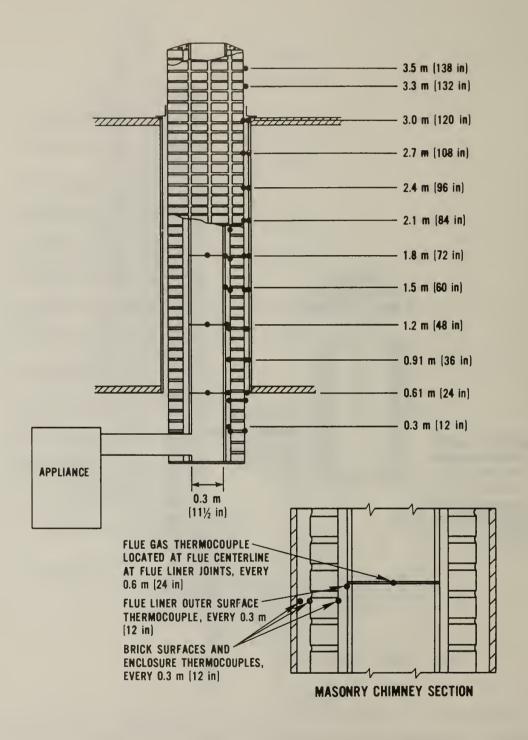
Instrumentation Locations for Tests of Masonry Chimney 3.
